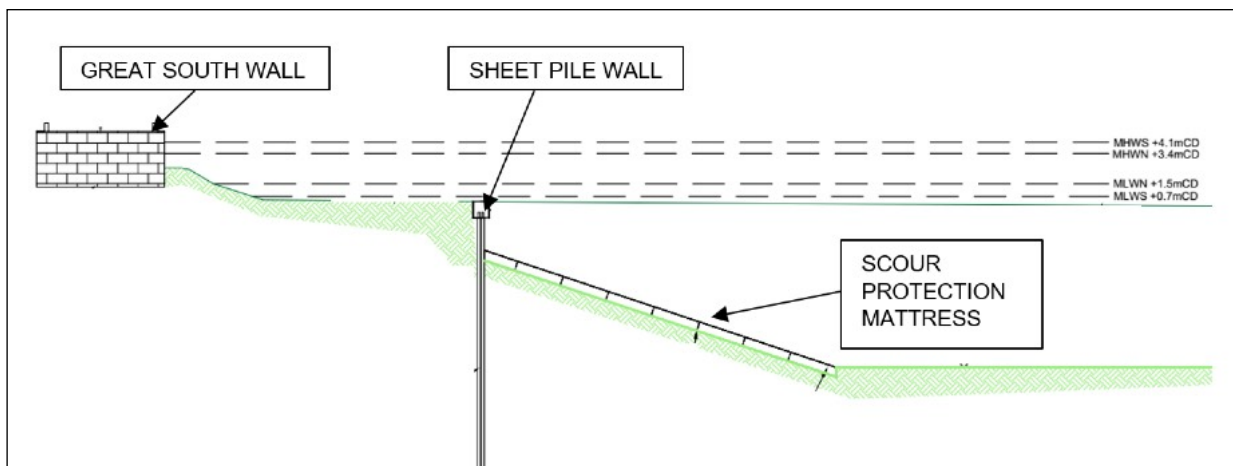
Design Progression 3 Sheet Pile Wall at Great South Wall
